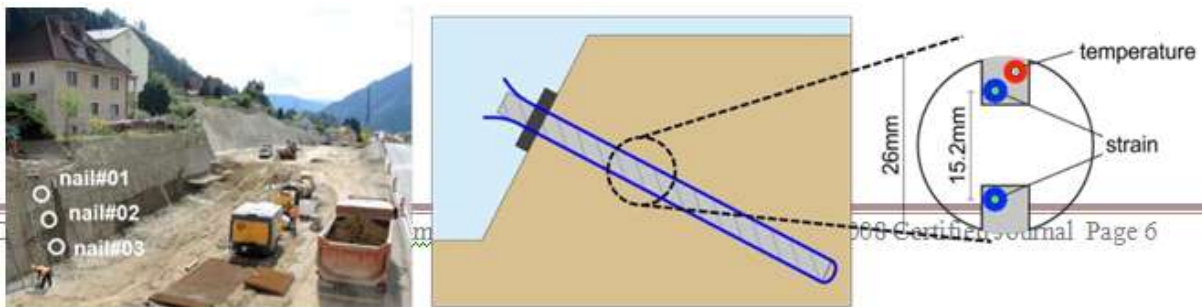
Fibre optic equipped soil nails at a construction site with three sensing nails (left) and their cable layout(right)
